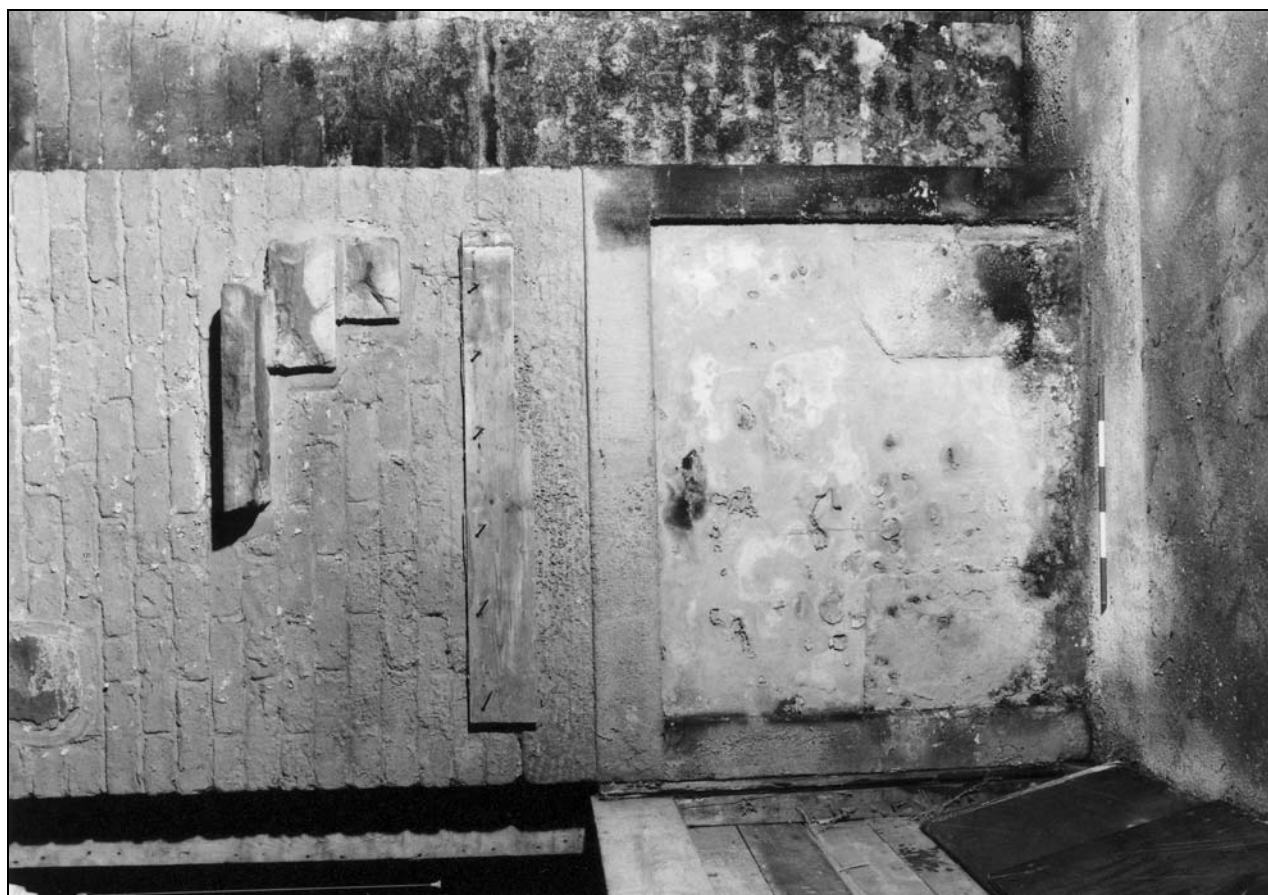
Blocked fireplace on ground floor of workshop, from the west (film 5, frame 6)
